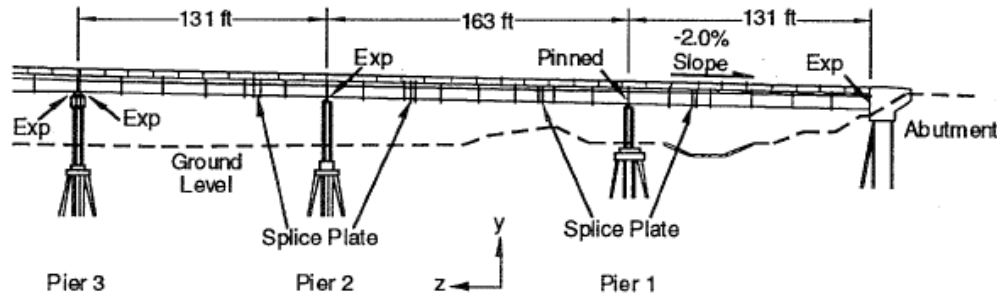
Elevation View of the Portion of the Bridge that was Tested
